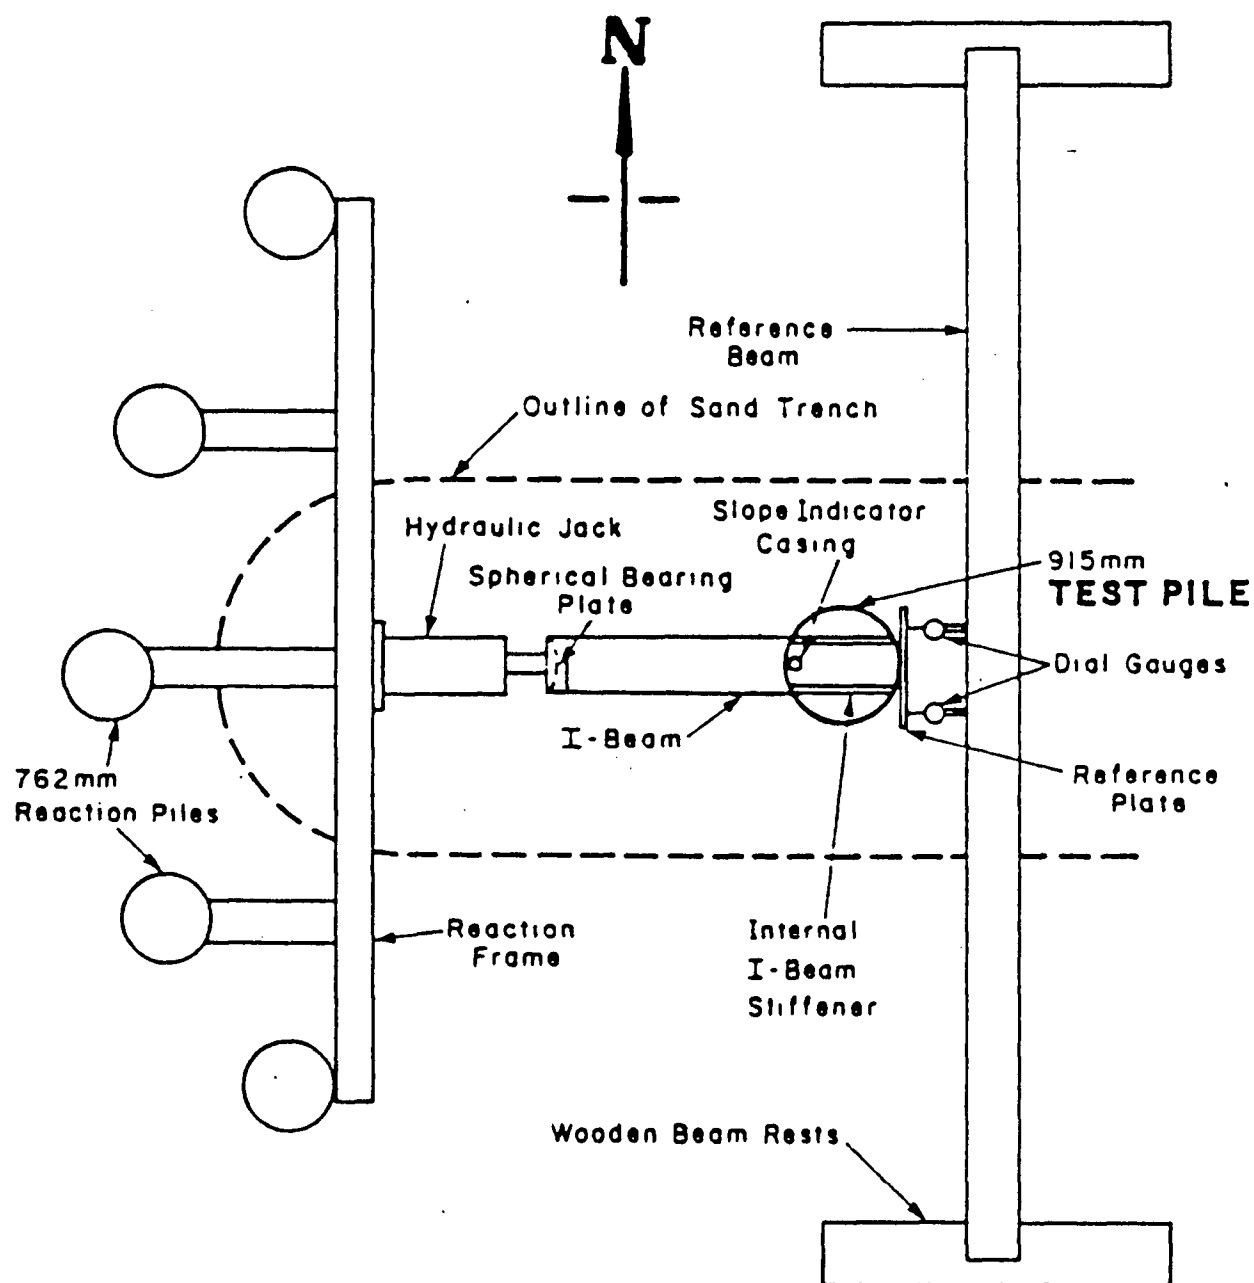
MOTHPRS LATERAL PILE LOAD TEST ARRANGEMENT
